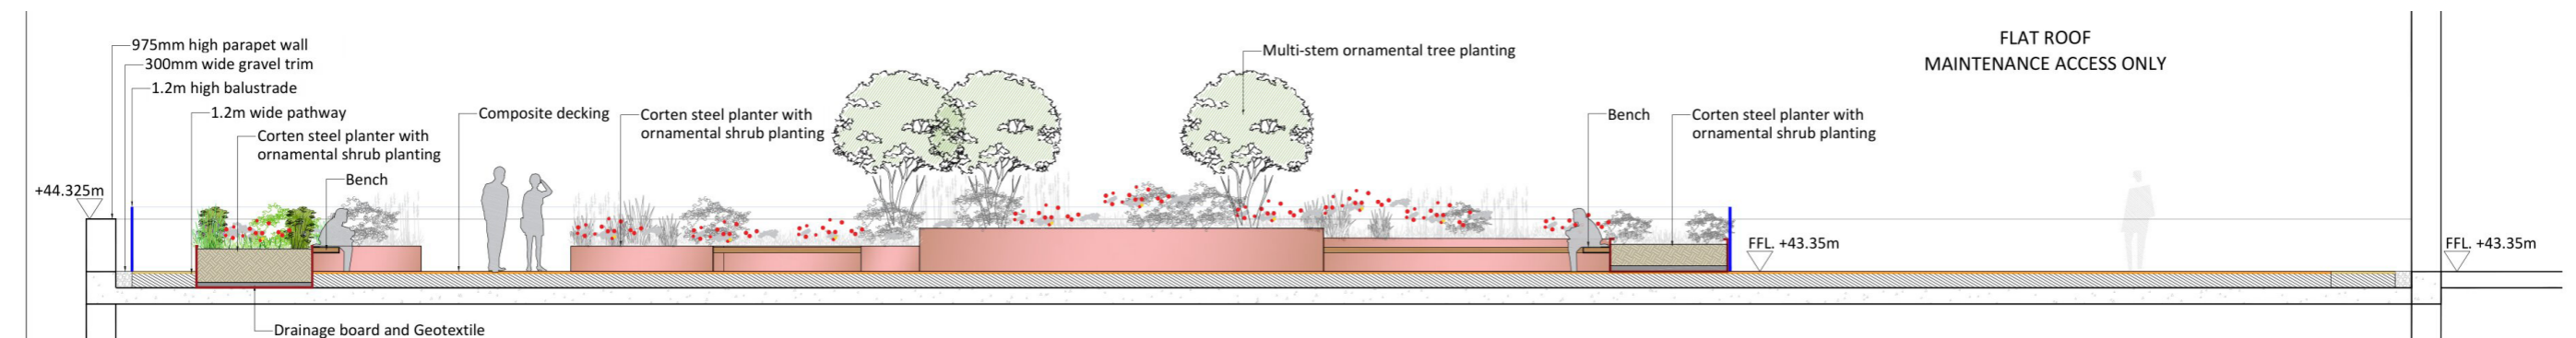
Section Through Block Q Sixth Floor Roof Terrace
